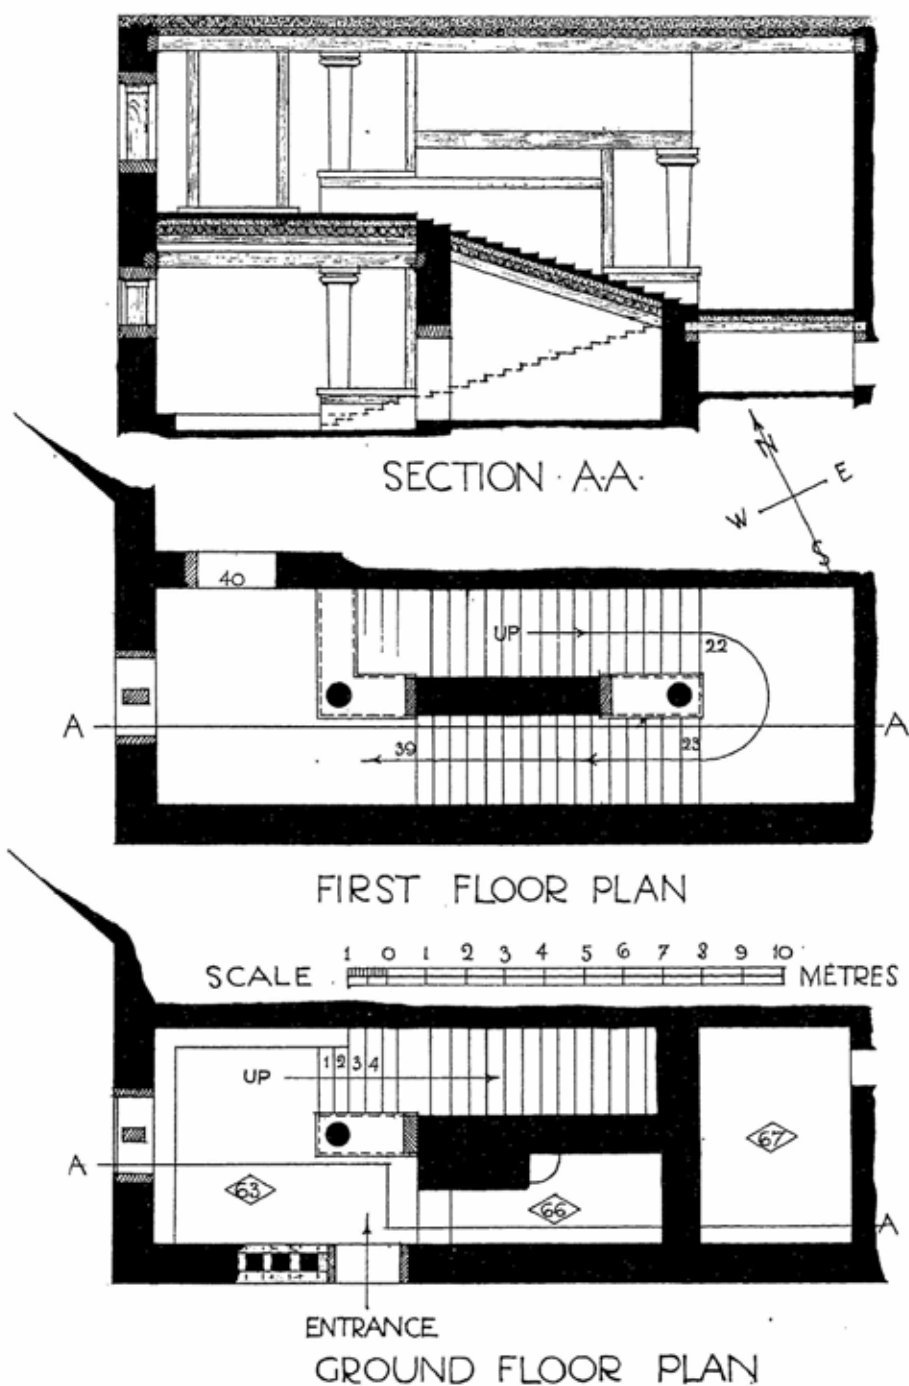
GRAND STAIRCASE, RESTORED. PLANS AND SECTION.
